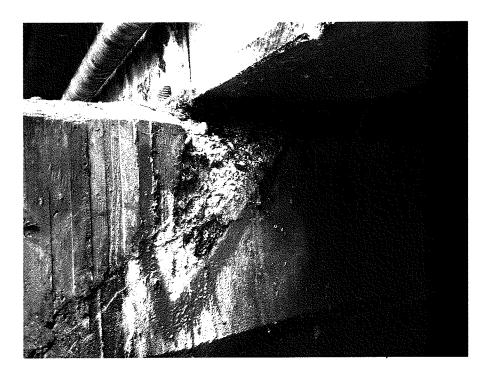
Spalling and Delaminations Water line on Southwest Side of Pier
